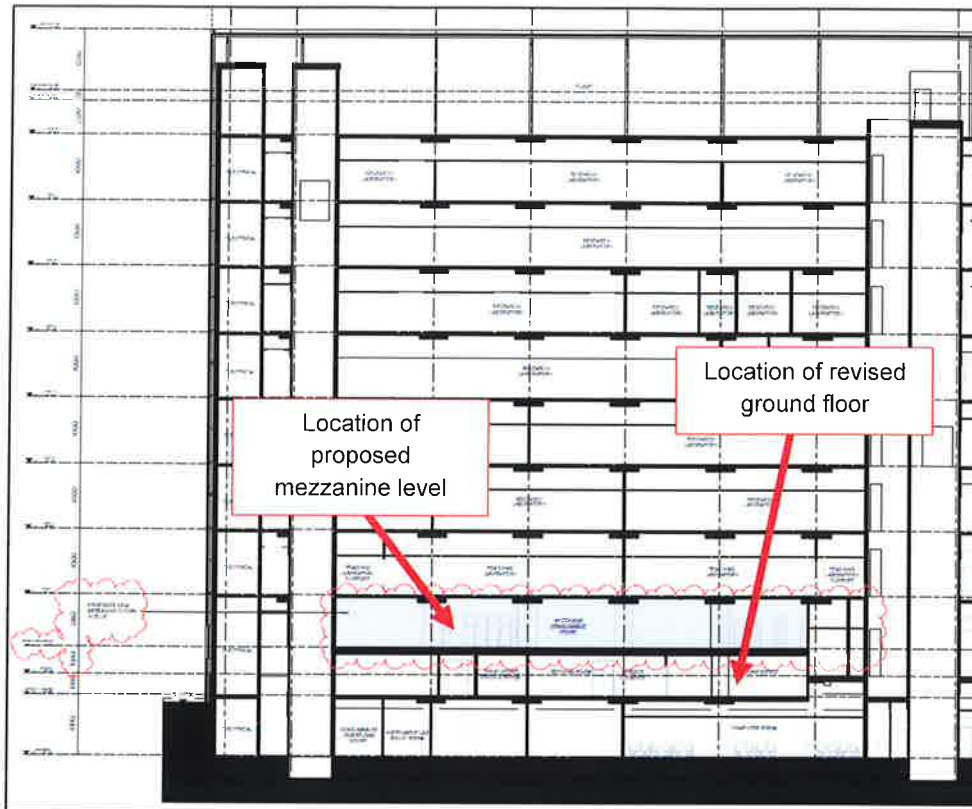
Proposed Ground Floor storage area (Source - SSD 7518 MOD 1 Modification Request)
